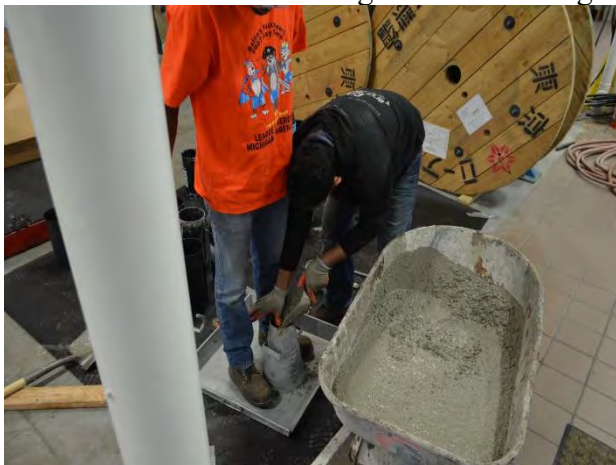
Slump test measuring 10 in. (254 mm)
